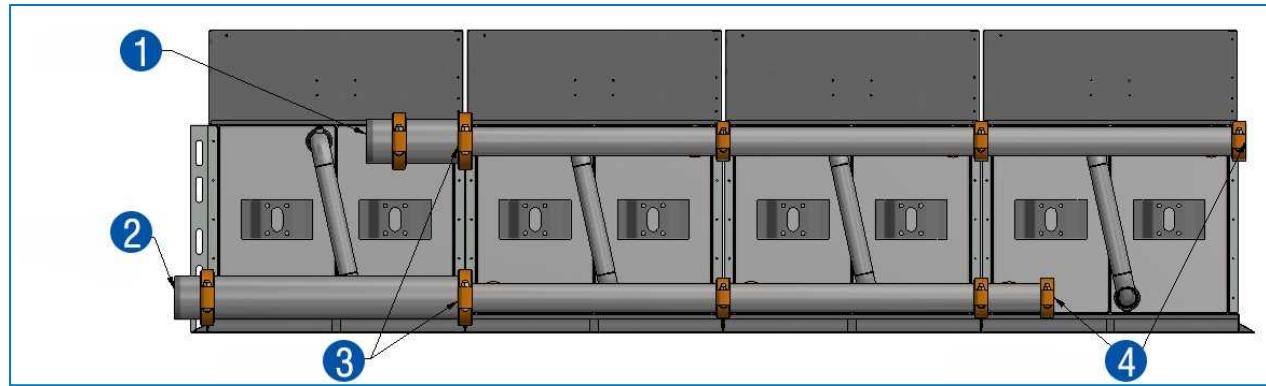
Manifold layout - 1. Connection inlet, 2. Connection outlet (LWT port), 3. Victaulic reducer, 4. Victaulic with end cap.
